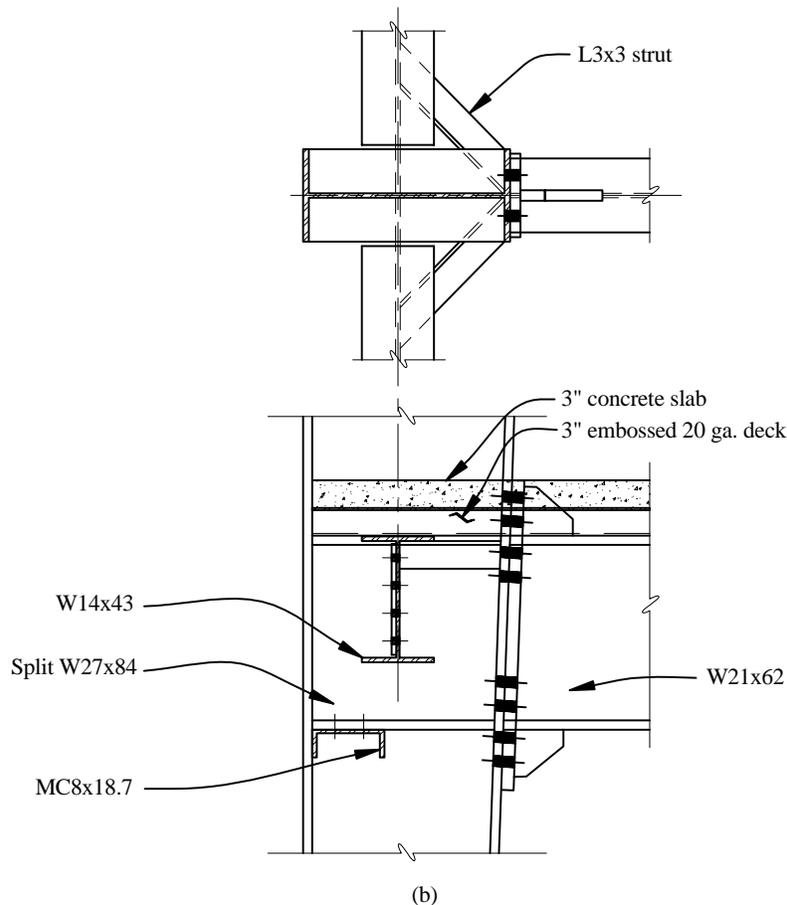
Mezzanine framing (1.0 in. = 25.4 mm).
